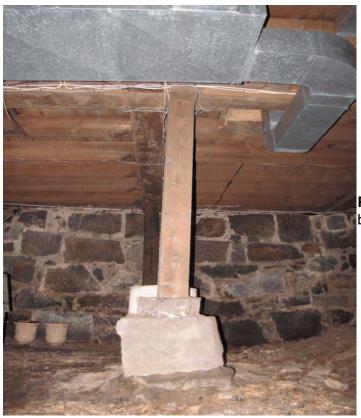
Wood post at north end of sanctuary bearing on stacked stones and out of plumb.
